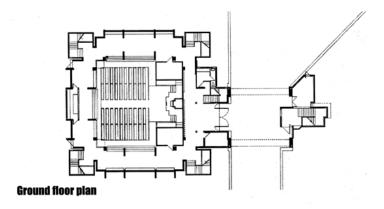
Ground floor plan of the Dutch Reformed Church. Note the scale of the entrance doors. (Peters & Kotze, 2013:38)
